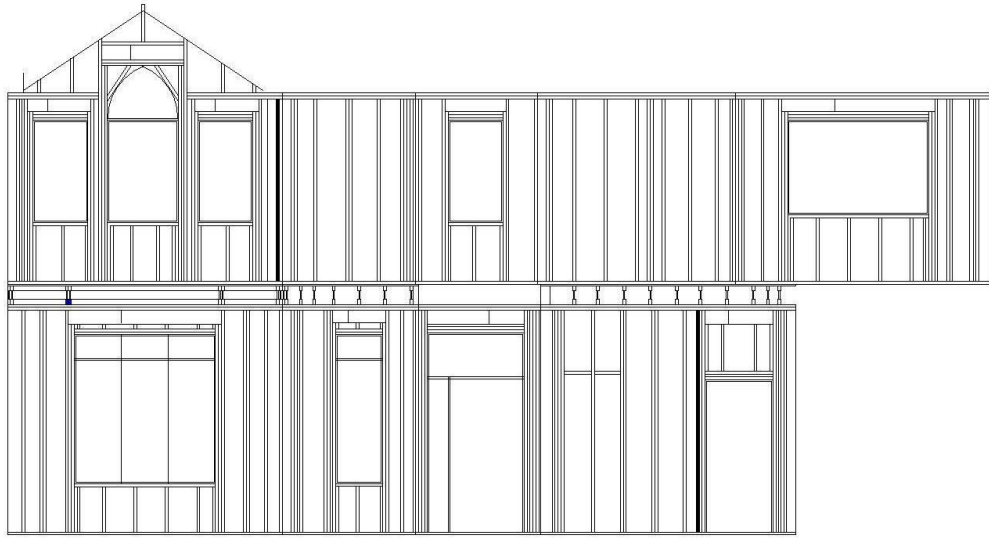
Detached house DH4 front (extended) elevation with the as-built studs installed on the first and second floors including the rim joist area.
